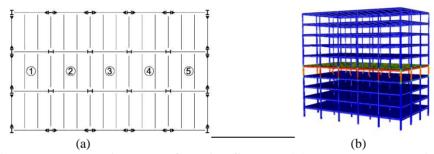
(a) Floor plan showing path of moving fire, and (b) FEM results showing damage to structural members
